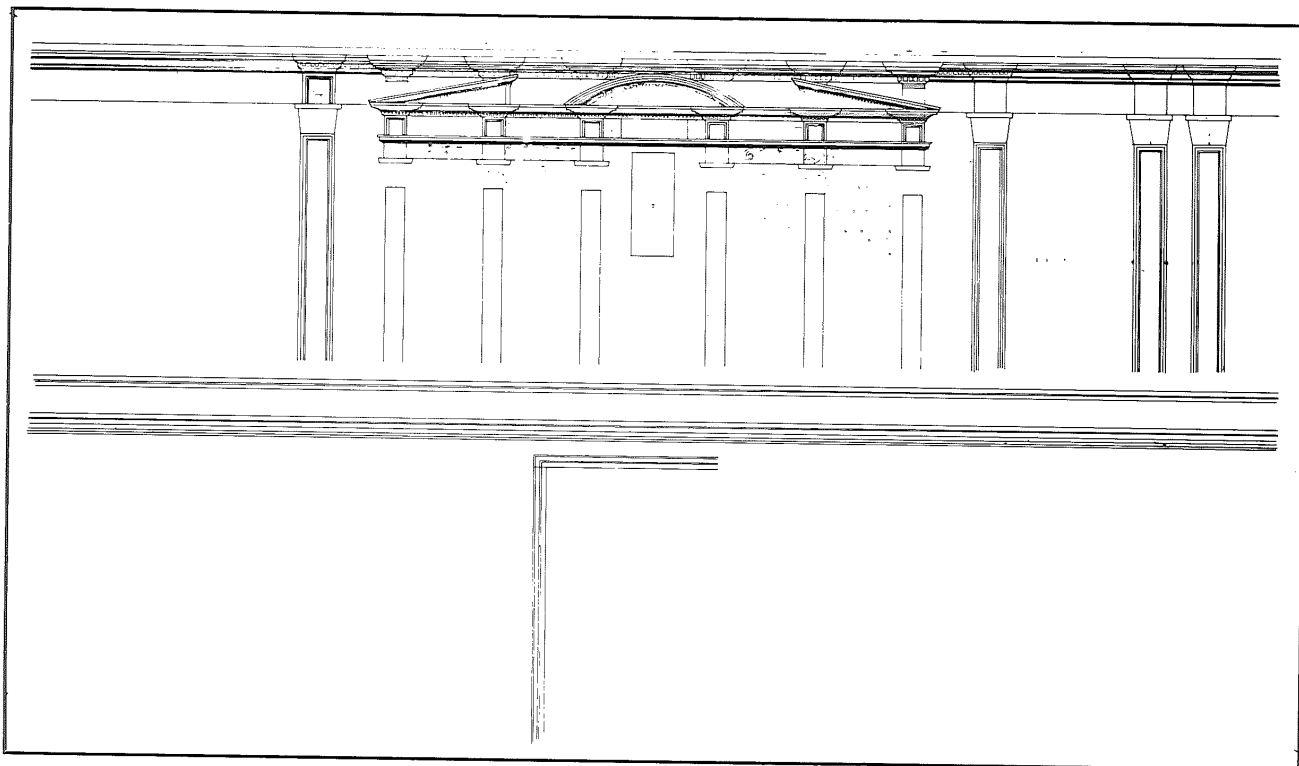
Architectural stucco on S. Wall (F. Larché).
